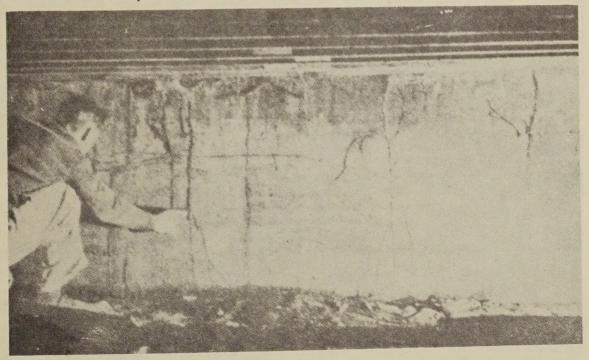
Look for these tunnels (the thickness of a lead pencil) that the termites may have created over the walls or foundation (especially around the window sills in your garage or basement of your home. Follow these tunnels down into the ground). Break them up. They will crumble by simply touching with any instrument. Give these a good application of Termitgas using your oil can. At the bottom of these tunnels if there are no crevices or cracks—use your cold-chisel as directed in method 2.
